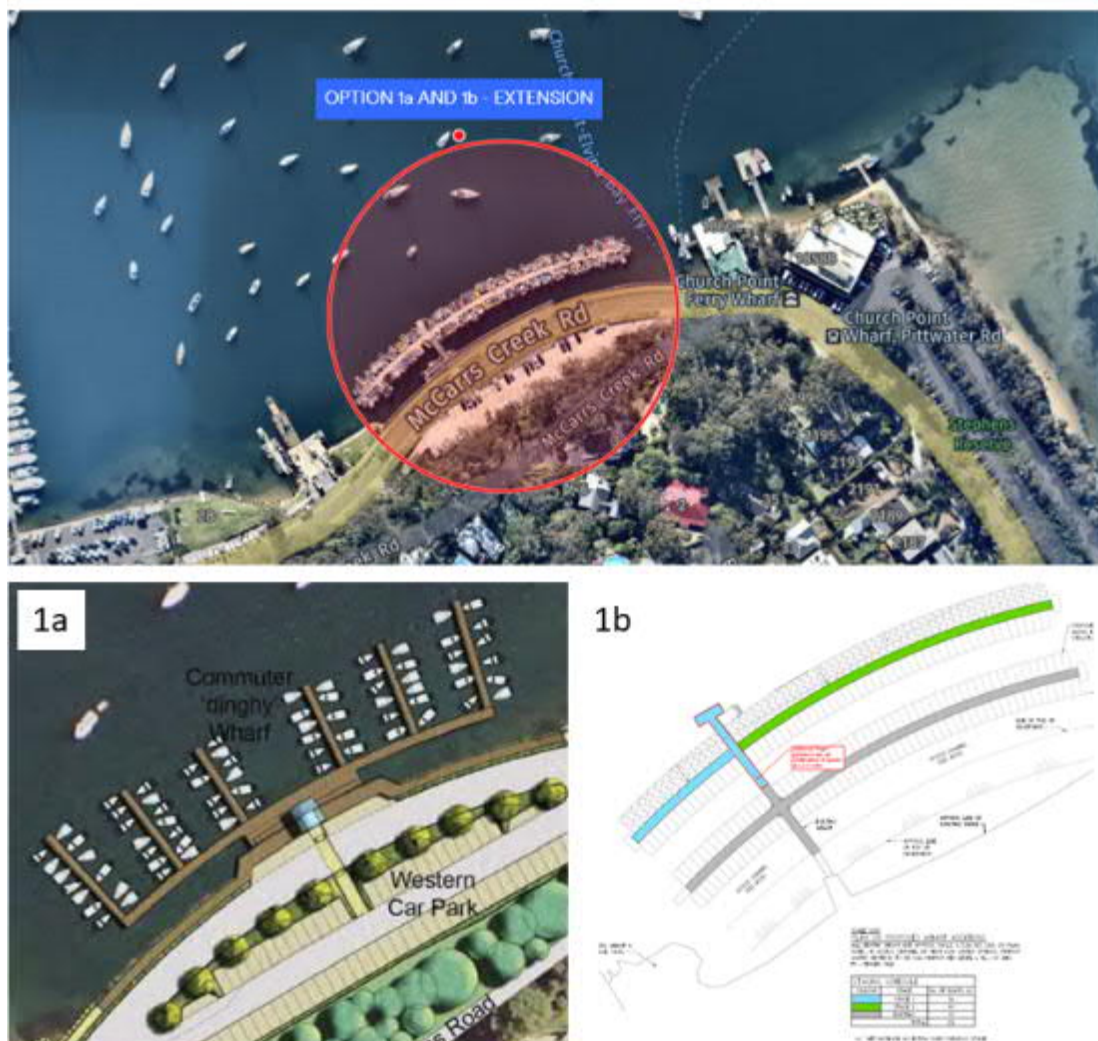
Option 1a and 1b - Extension to the Existing Church Point Commuter Wharf.
